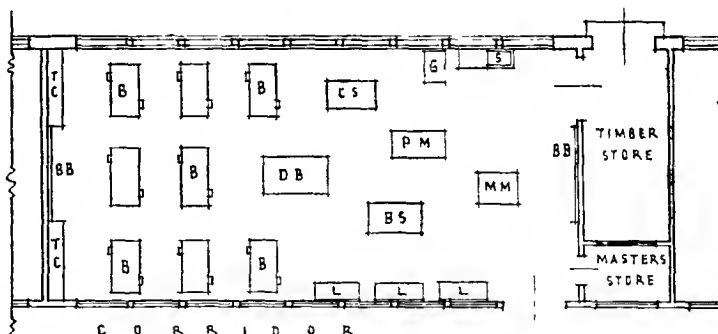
Typical carpentry room: 15-20 places: 850sq. ft.; 30 places: 1,200sq. ft.
